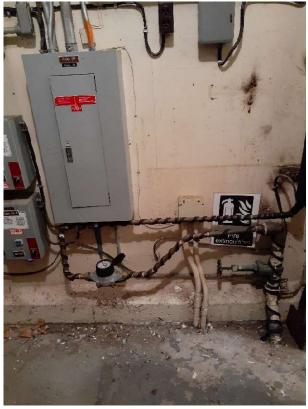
Representative photograph of the Mechanical Room in Building 138.Non-asbestos containing white caulking located at the seam between the floor and the wall [Sample ID: 138-AS-01A-C]. White paint on the wall [Sample ID: 138-LP-01; 362 ppm lead] and grey paint on the floor [Sample ID: 138-LP-02; 2,320 ppm lead] confirmed to contain high levels of lead.
